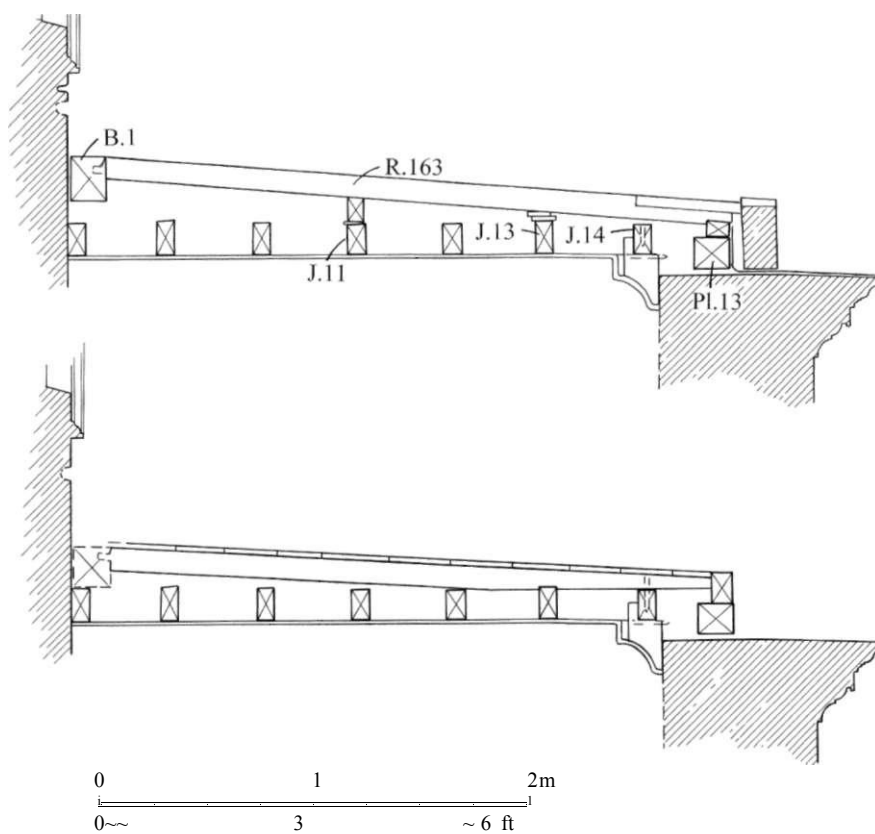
Section of south aisle roof: as found (above) and as built (below)
